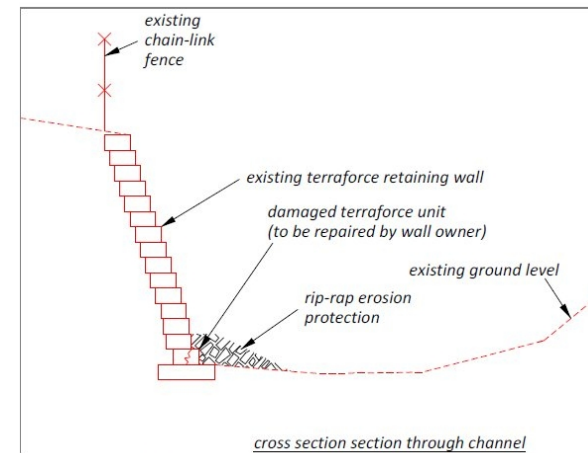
Protection of Retaining Wall Foundation at 'Die Rand'
